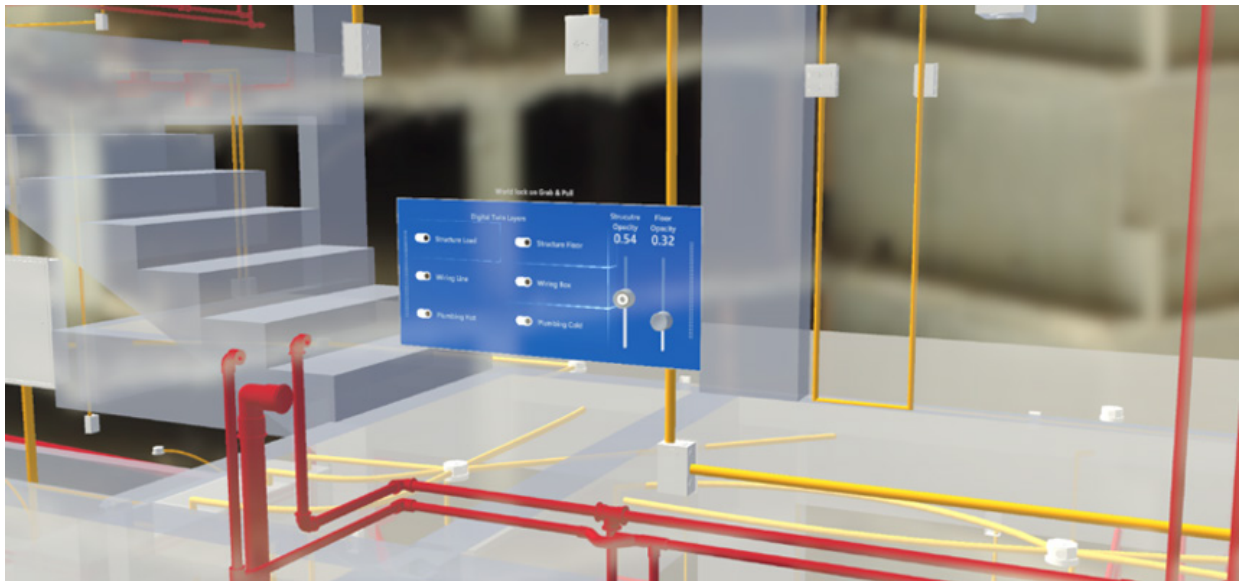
Immersive AR version of BIM@Construction: 1st person view
